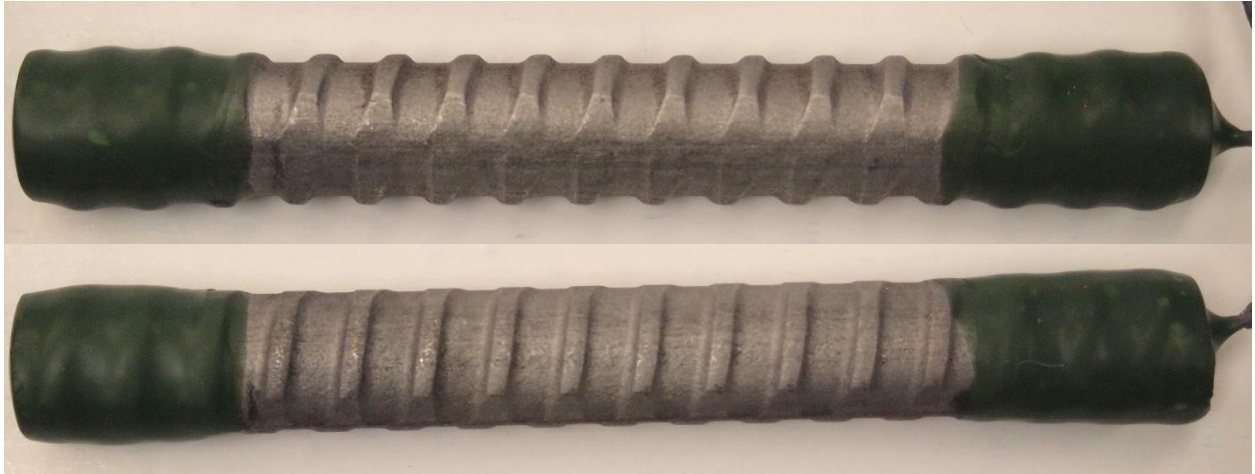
Specimen PKSBT-03 before testing (top) and after testing (bottom)
